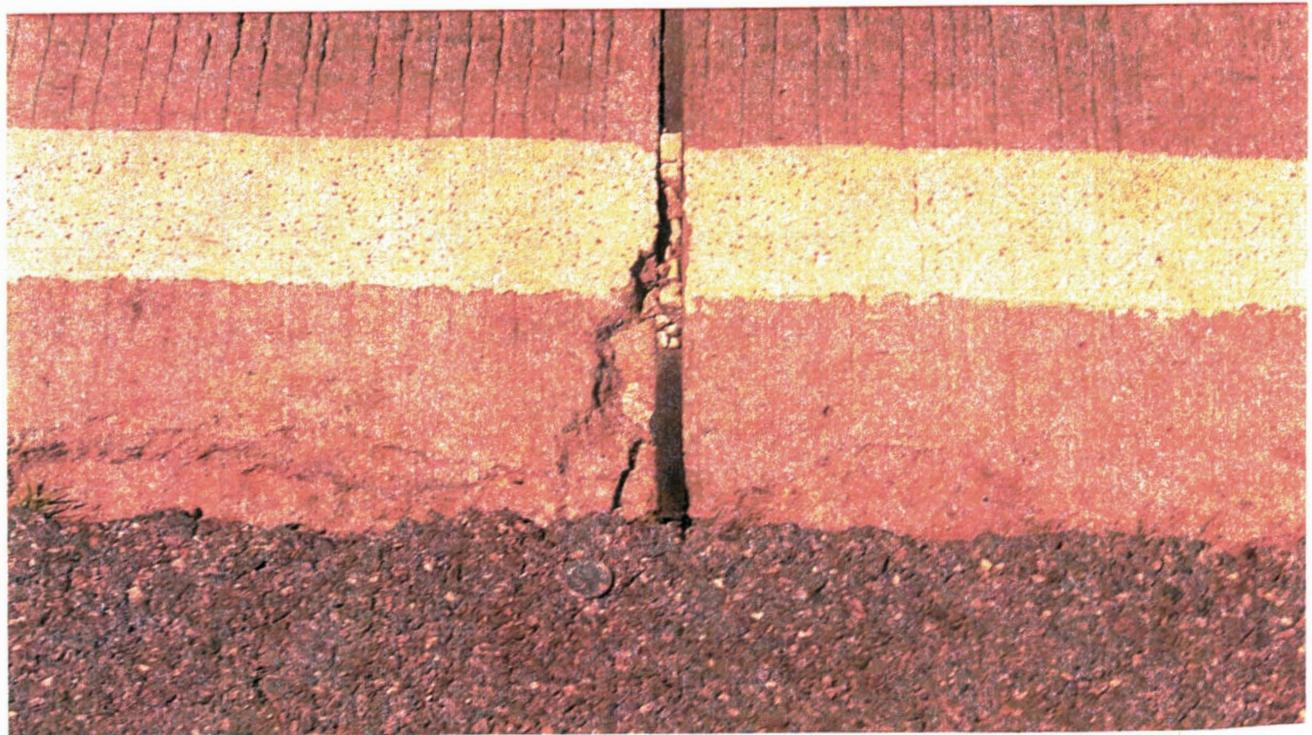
Typical Corner Crack and Spalling at Outside Edge of Slab
